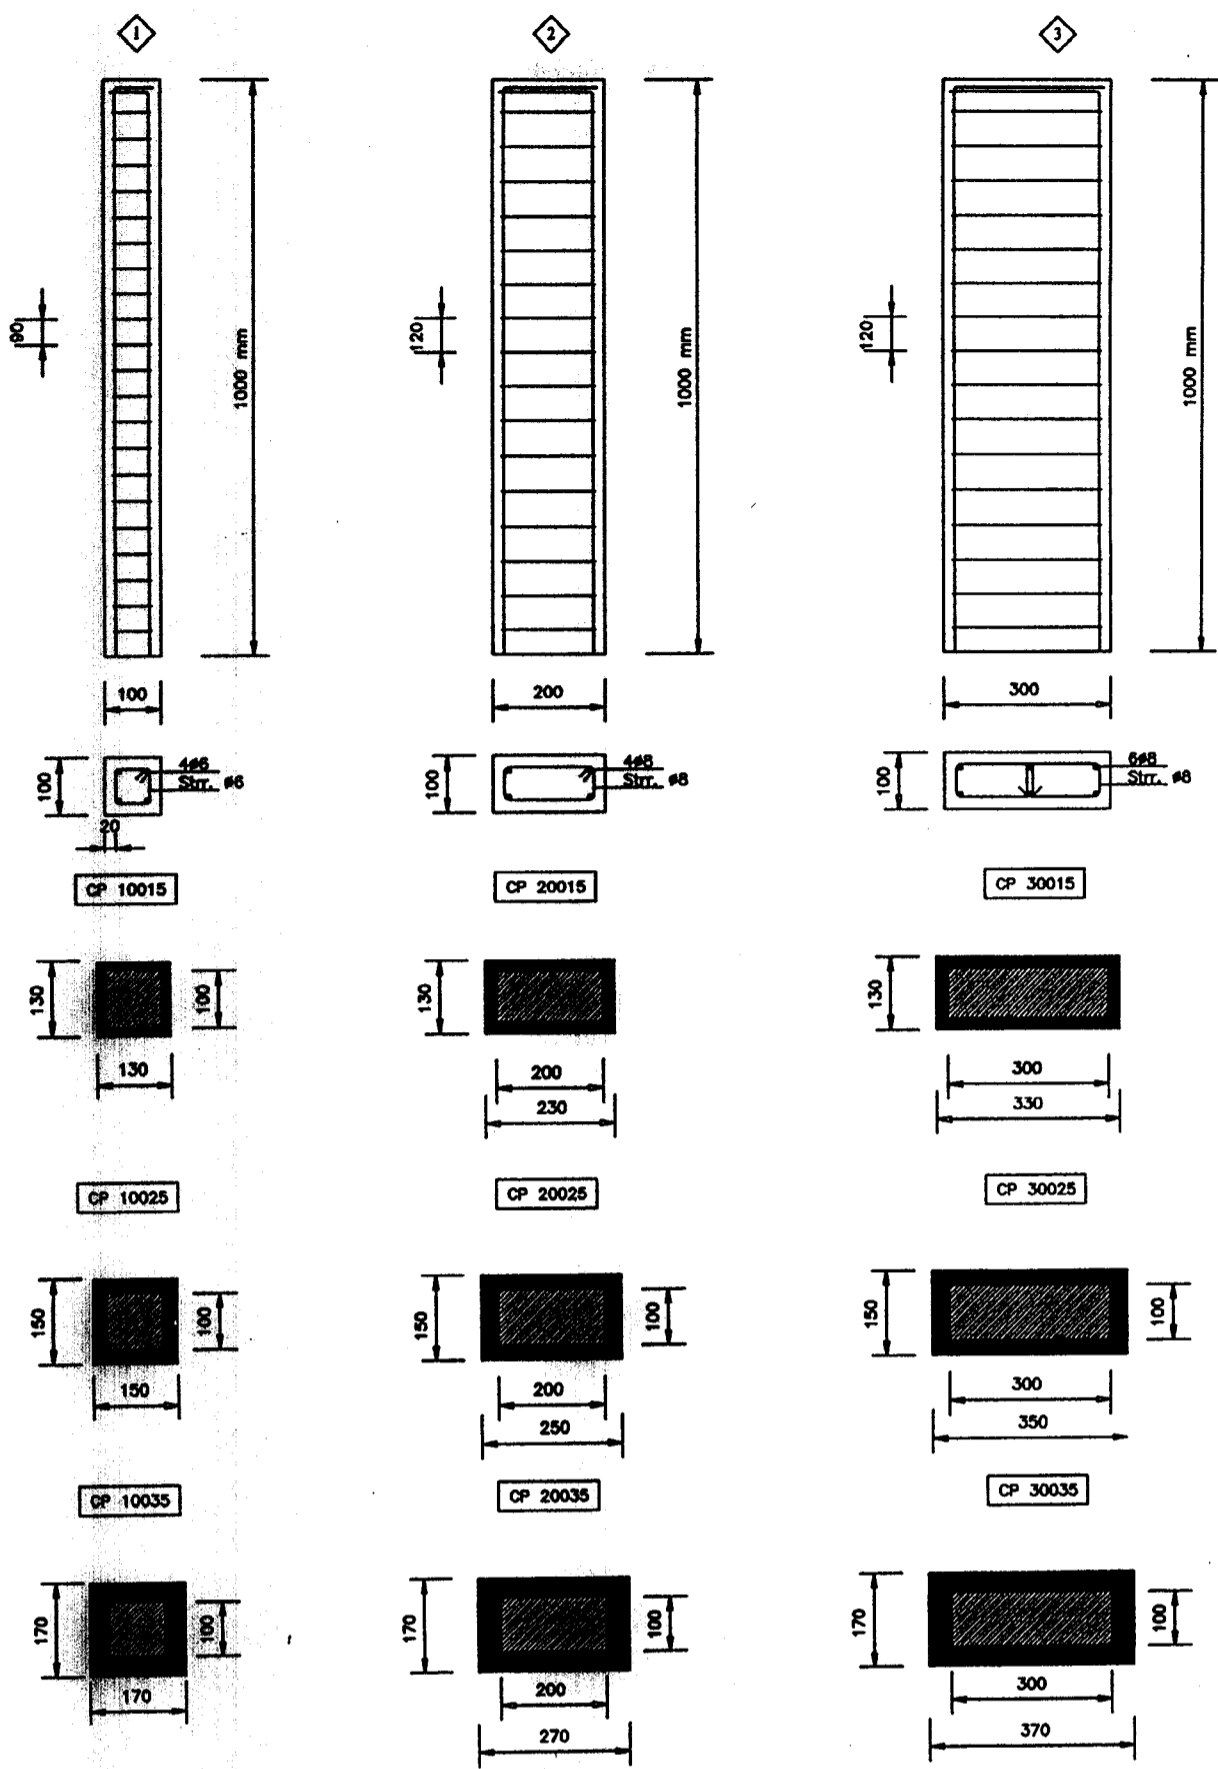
Longitudinal and Transverse Cross-Section of the Columns, and the Coat Thickness on Each Column Dimension
